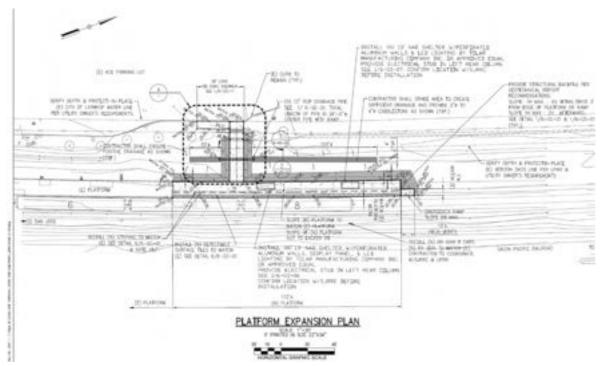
Lathrop/Manteca Station – Platform Extension Plan
